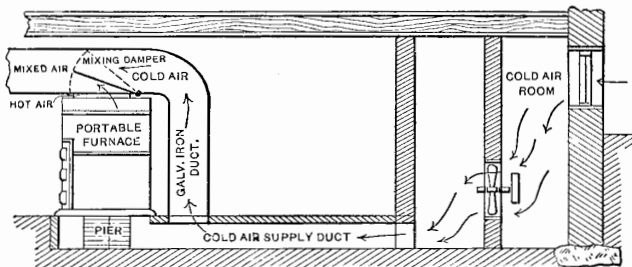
Sectional Elevation of Fan-Furnace Combination.
